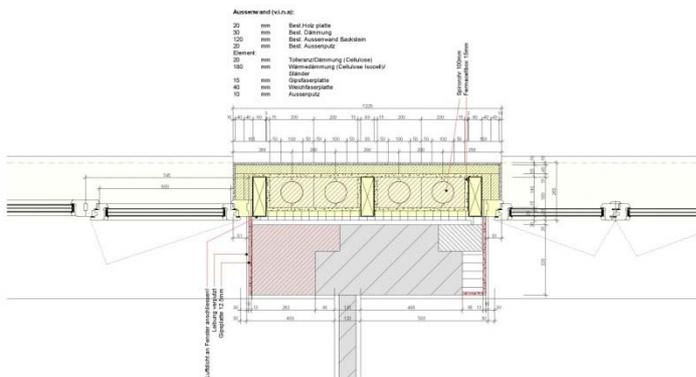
Ventilation ducts built into insulated prefabricated timber external wall panels
